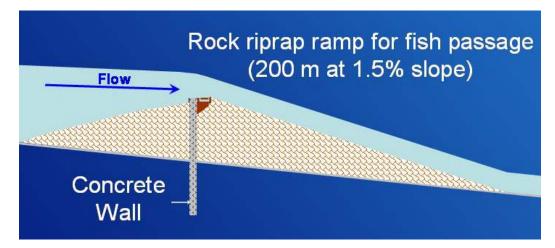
The longitudinal river profile shows the concrete diversion weir (labeled as wall) and rock ramps constructed to enable fish passage.
